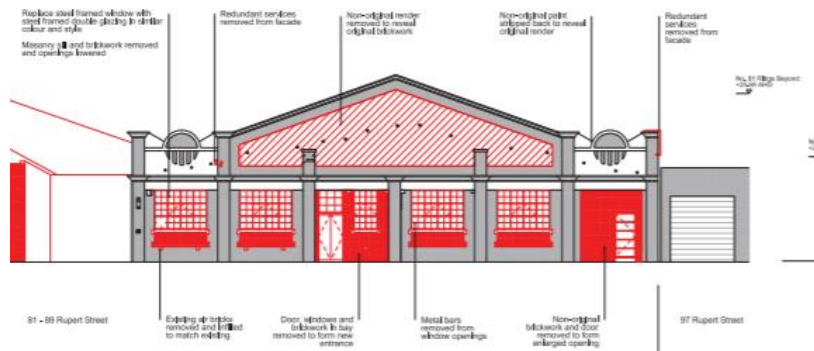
Part demolition shown in red to make way for new openings to the former Davis' Pickle and Sauce Factory building.
